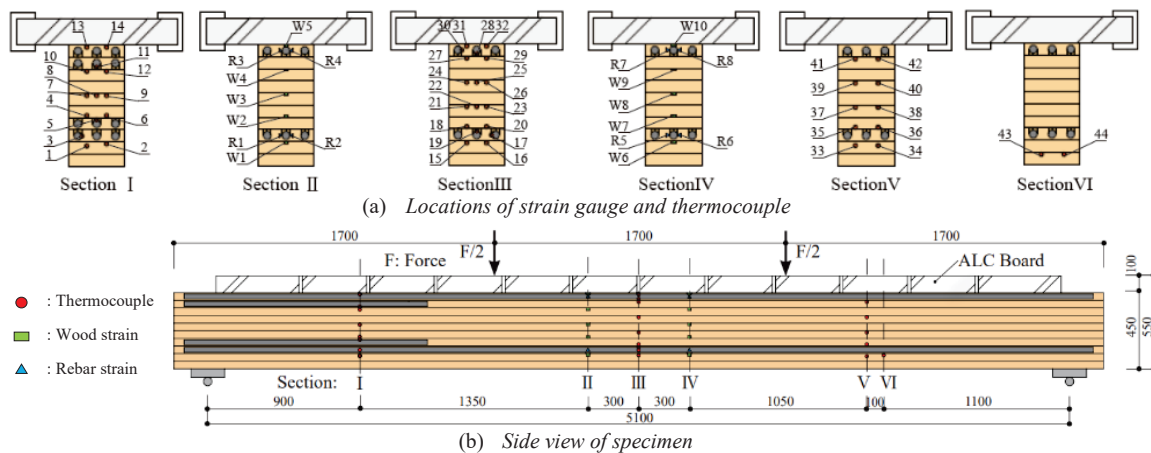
Side view of specimen and Locations of strain gauge and thermocouple
